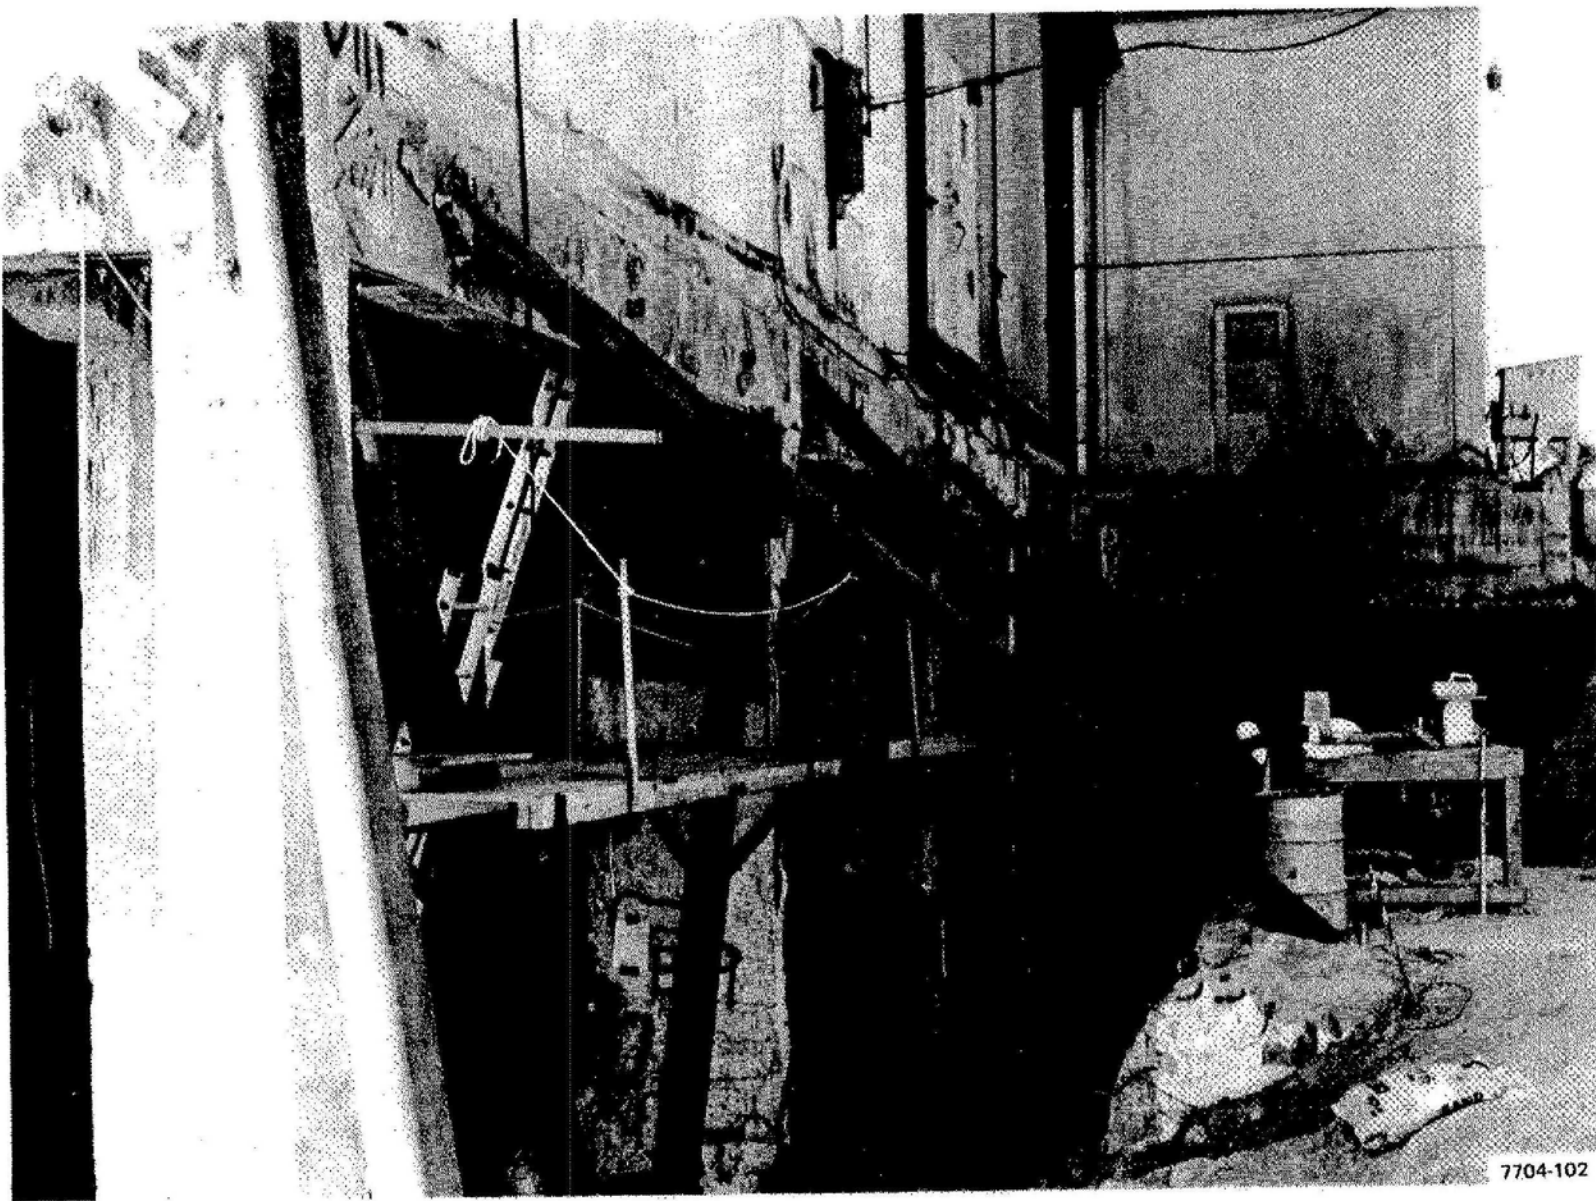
Column Supports and Seismic Bracing Installed under North Wall of SRE High Bay
